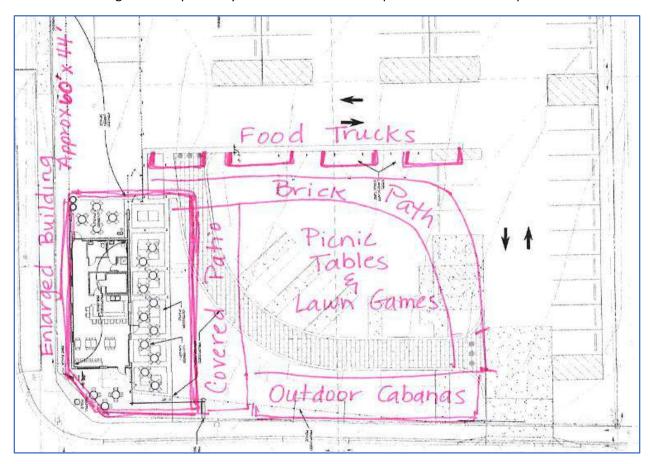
Proposed layout with 2500 to 2600 square feet of covered space
